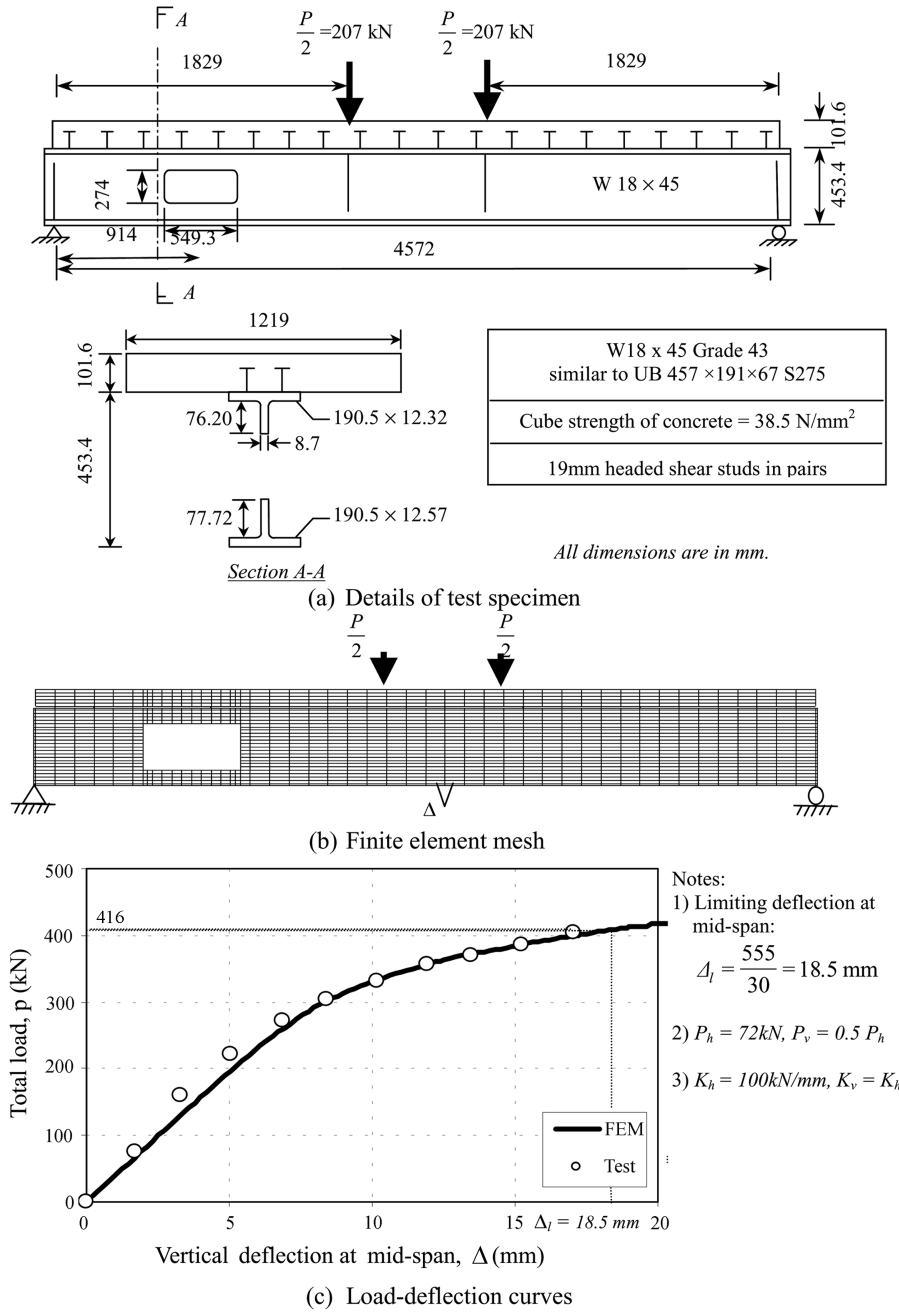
Perforated composite beam with solid concrete slab - Test CD4
